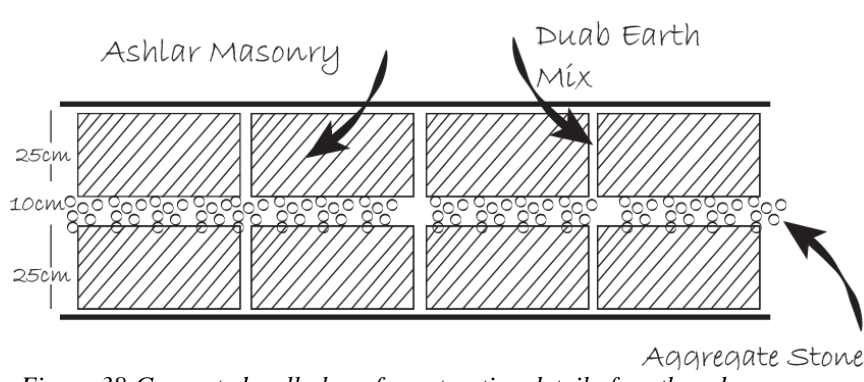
Generated wall plan of construction detail of earth and masonry Stone mixture wall according to Ato Angasso.
